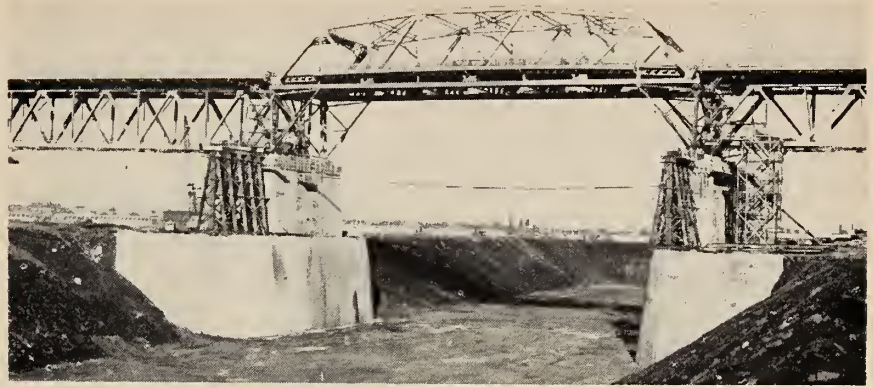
New span in place on erection legs after removing old span and channel falsework.
